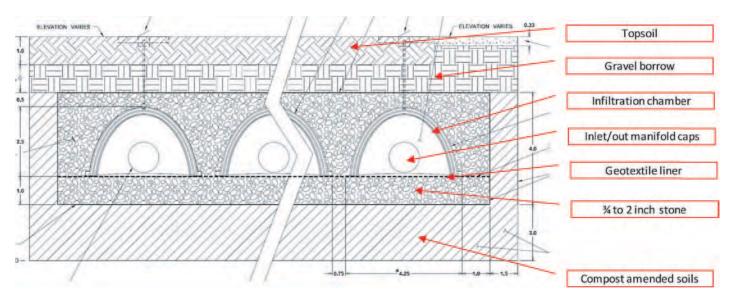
WSDOT Manette Bridge replacement, infiltration gallery cross section.
